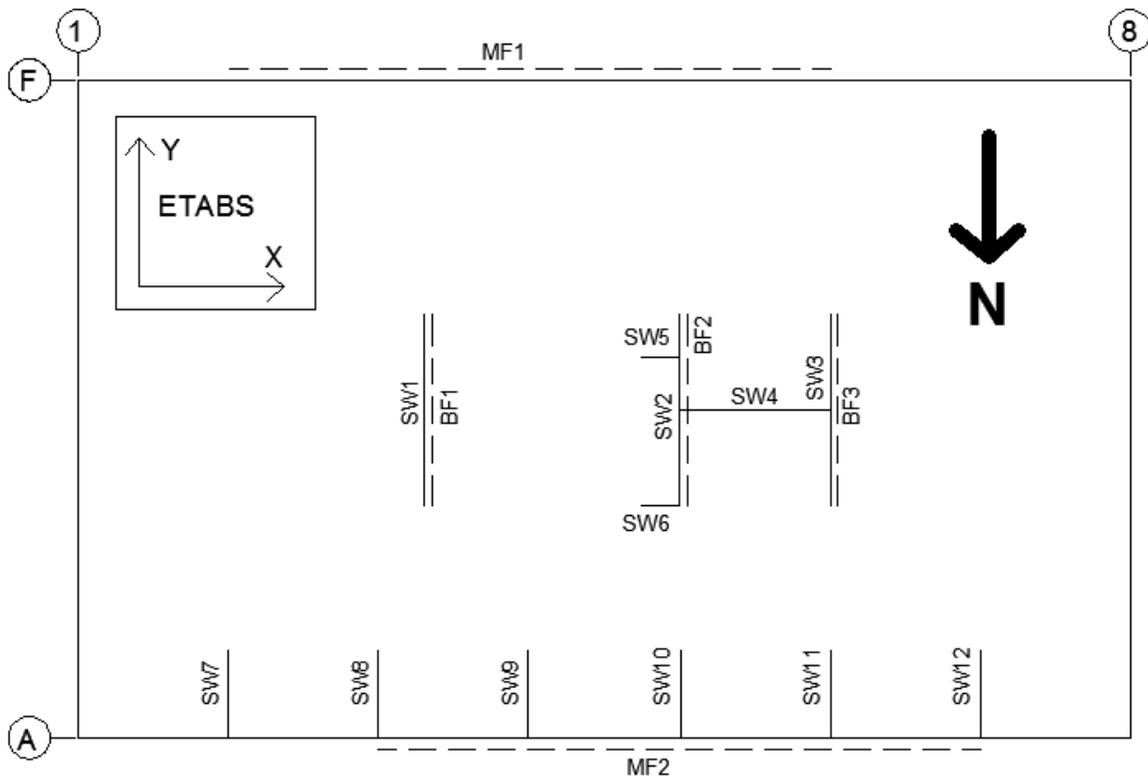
Labeling of Lateral System Elements (Source: Chavanic)
